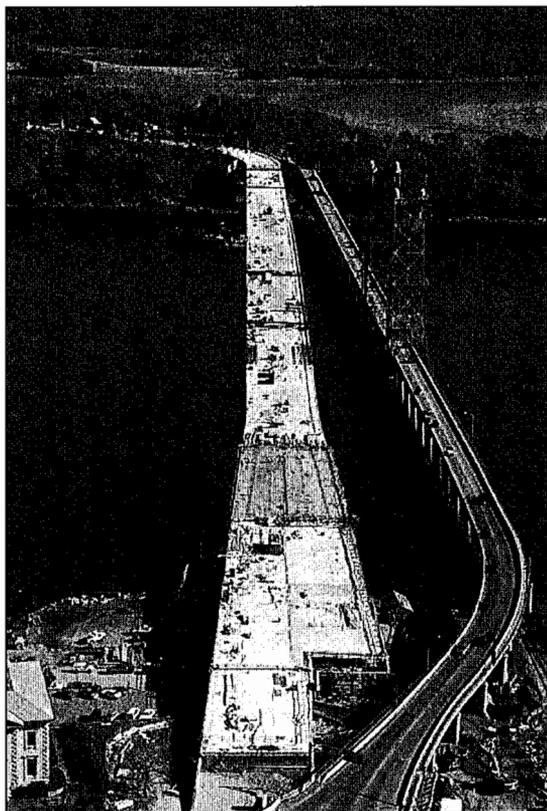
The overlapping footprint at the Bath abutment was handled by building the first span in two phases.
